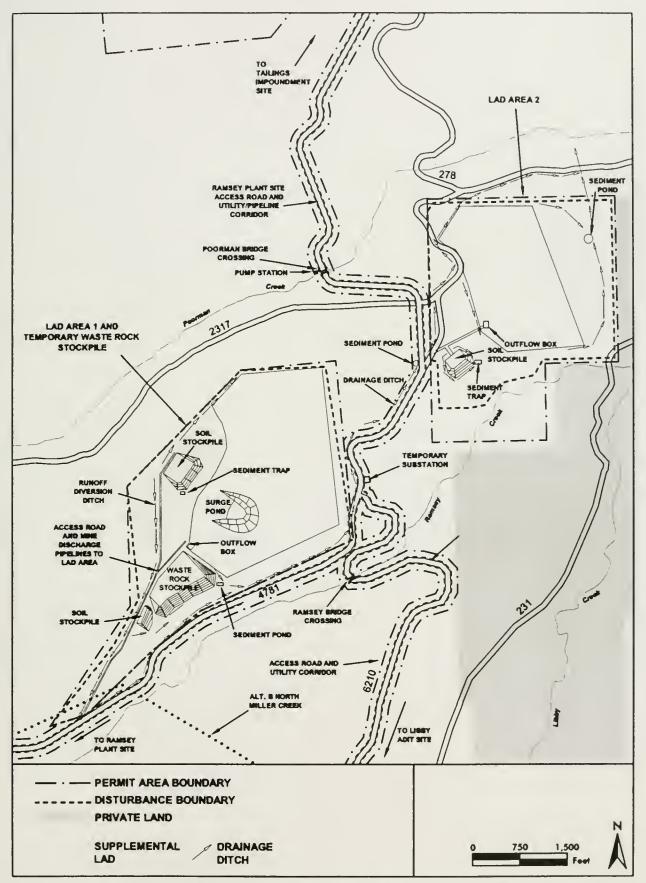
LAD Areas 1 and 2 and Waste Rock Stockpile, Alternative 2
